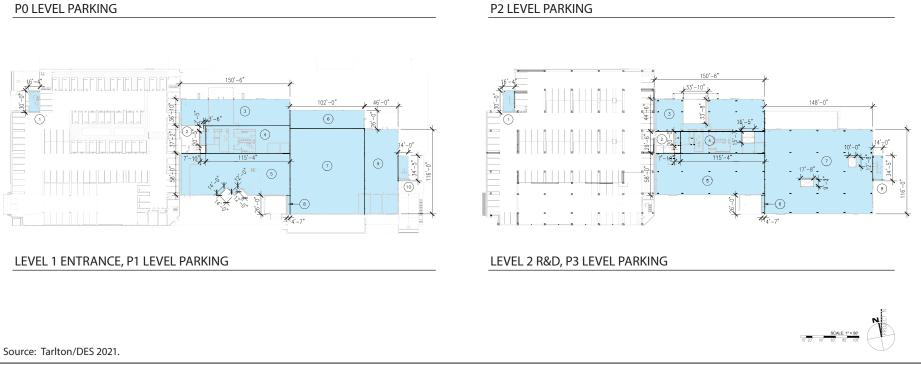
Site Plan by Floor (P0 Level Parking through Level 2 R&D/P3 Level Park 1350 Adams Court Project
